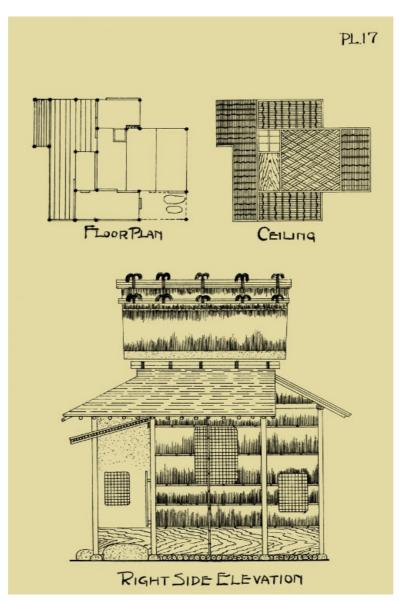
FLOOR PLAN, CEILING and RIGHT SIDE ELEVATION
